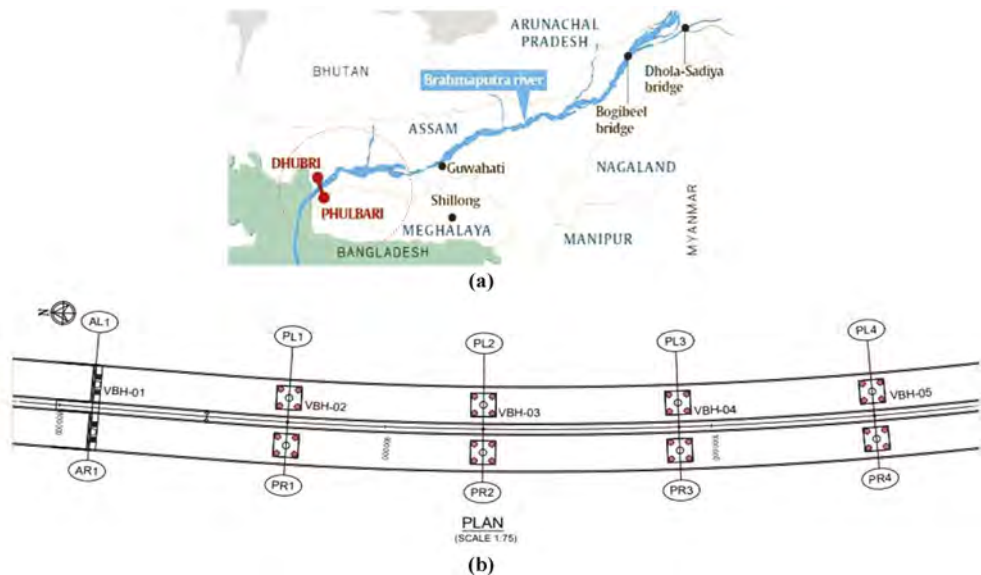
(a) Geographical location of Dhubri-Phulbari Bridge, and (b) Plan view of a small section of the proposed bridge indicating the location of the piers and the piles.
